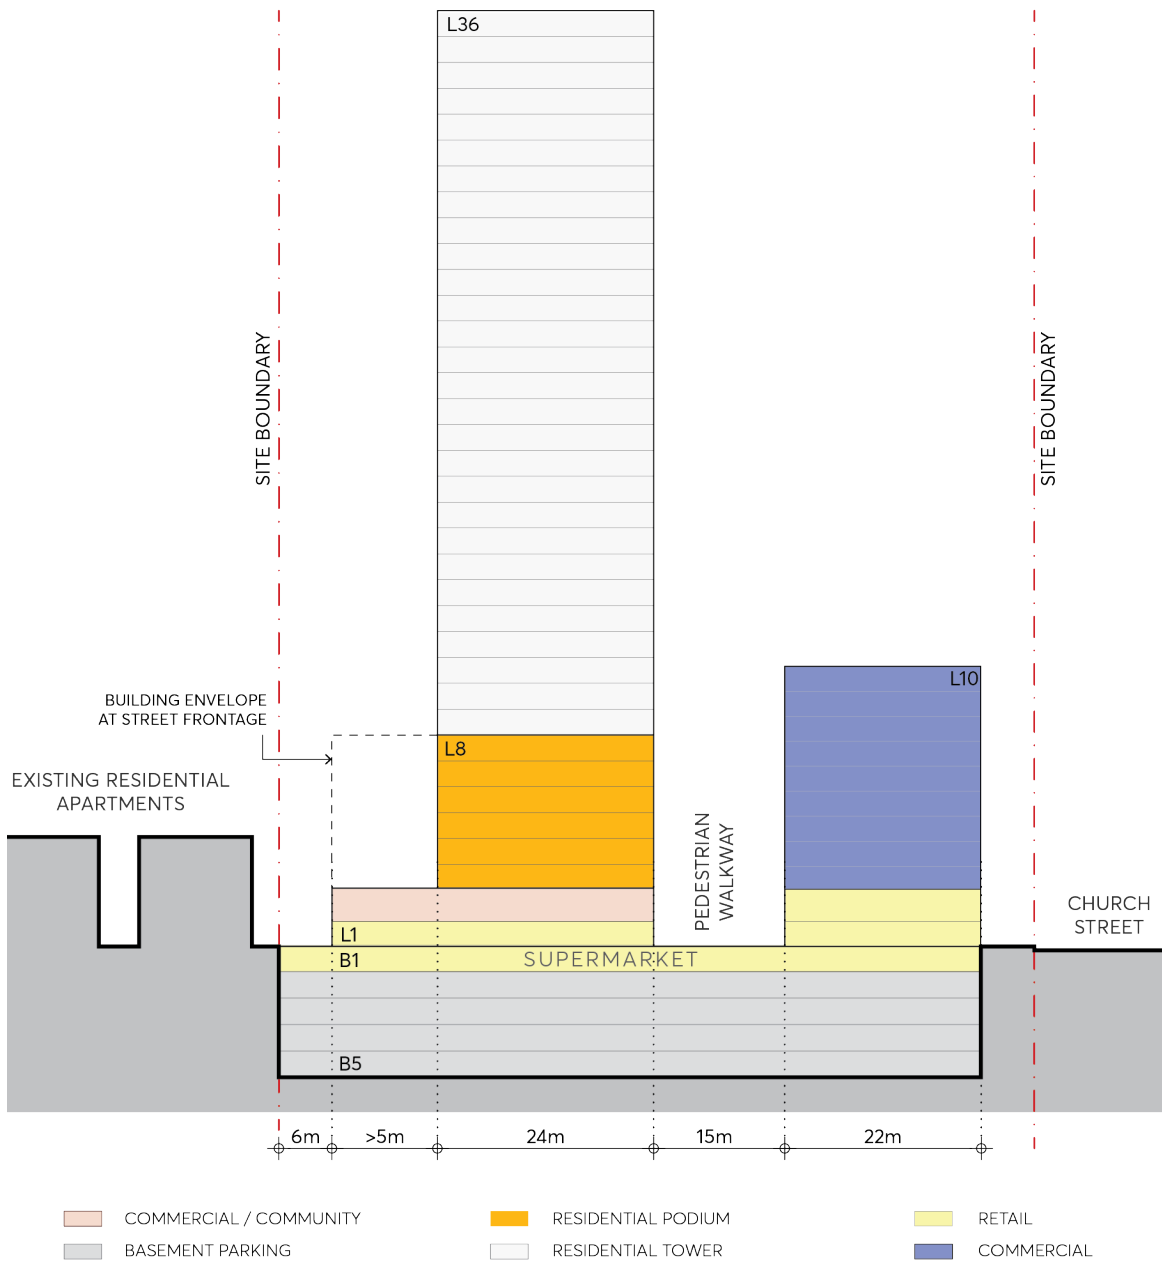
Building Form Control Section (Northern Side)
